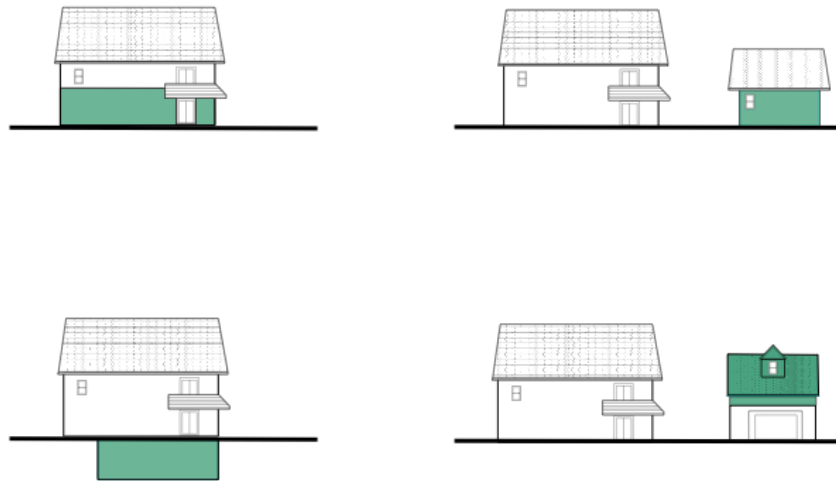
Examples of accessory dwellings in the same structure as the main dwelling (left) and accessory dwellings in a detached structure (right).
